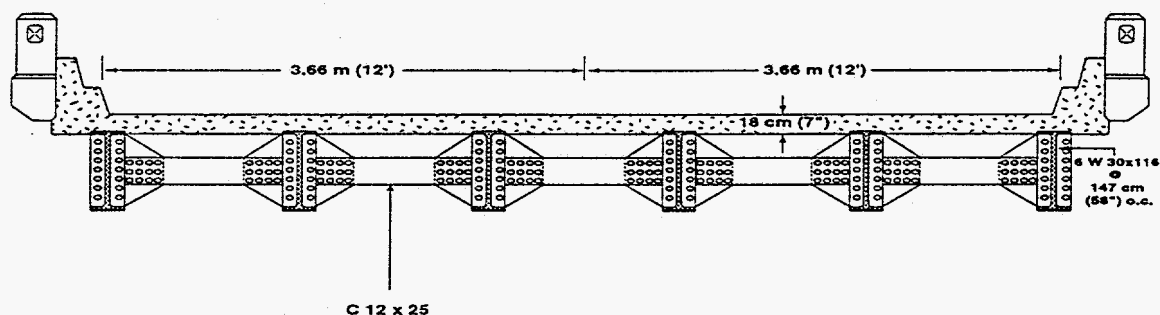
Cross-Section of Alamosa Canyon Bridge Span
